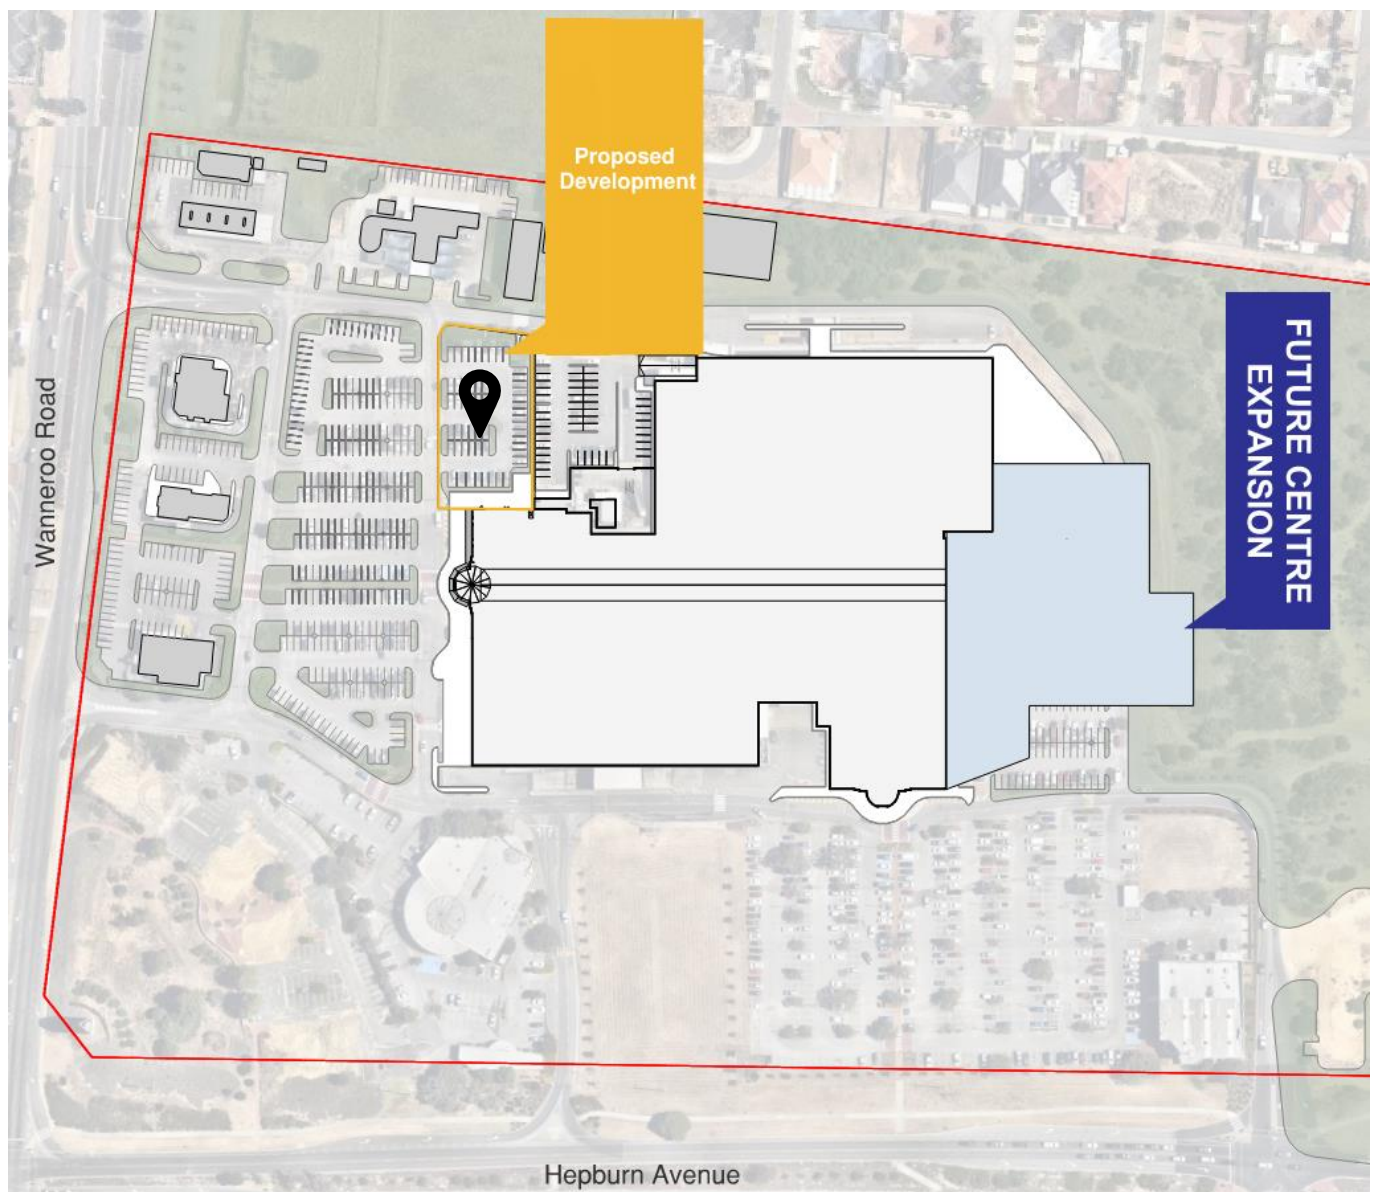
Site location of the proposed Kingsway City Shopping Centre development, as shown in orange.
